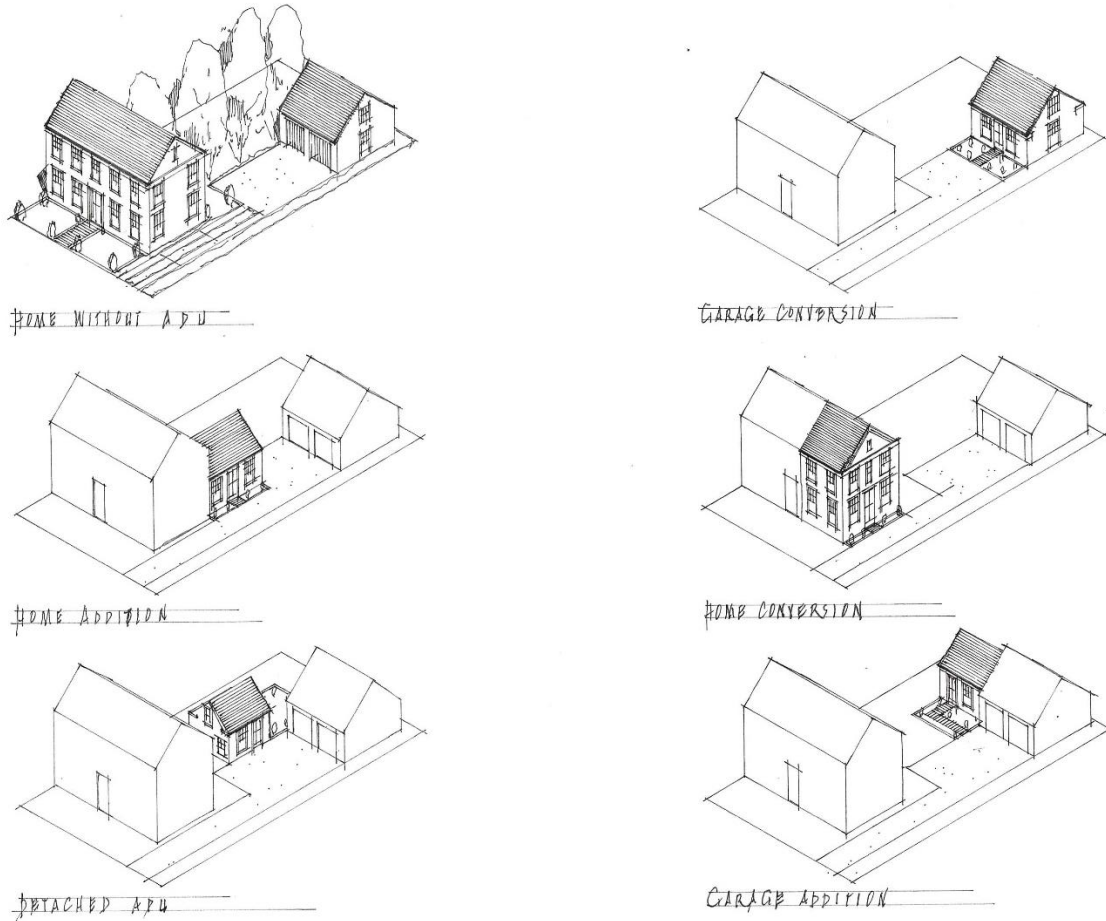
Examples of accessory dwelling units (a garage addition and an independent structure).
